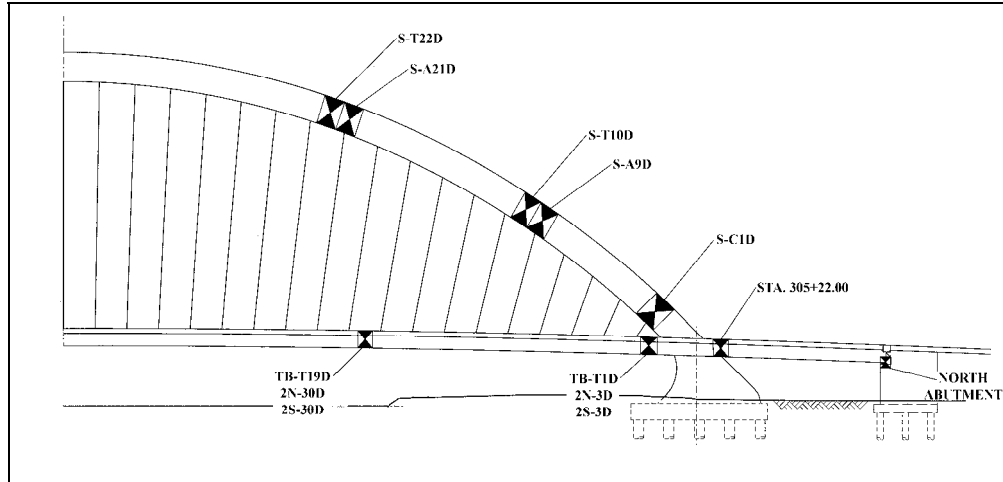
North Permanent Gauge Locations (Modified IRIB Specifications and Construction Plans)
